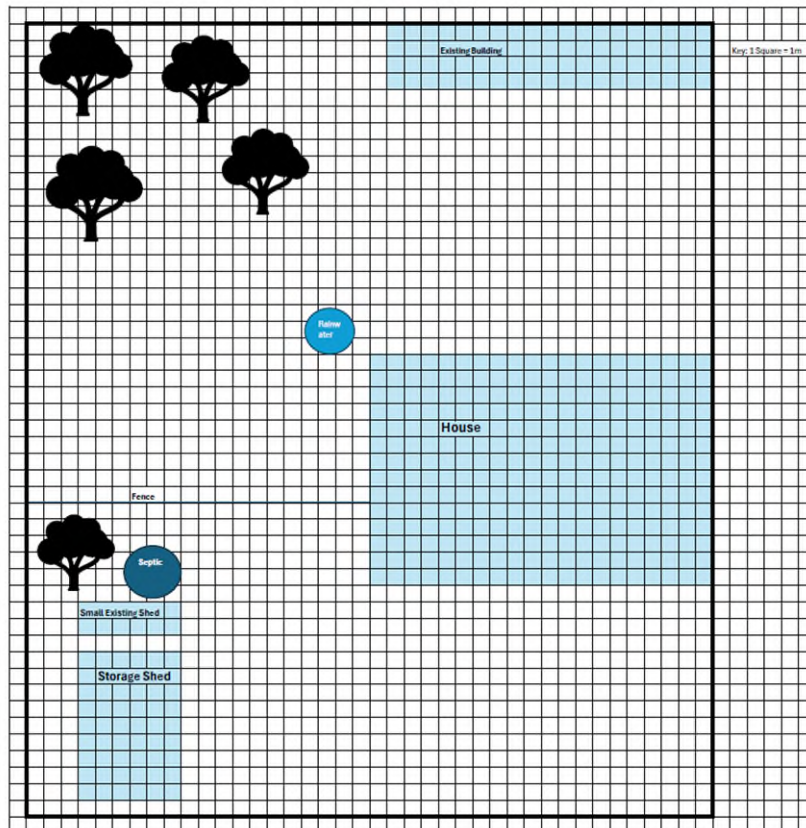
location of proposed shed on Lot: 3 & Lot: 4 Sec: B DP: 12124 – 6 Wattle Street Tullibigeal
